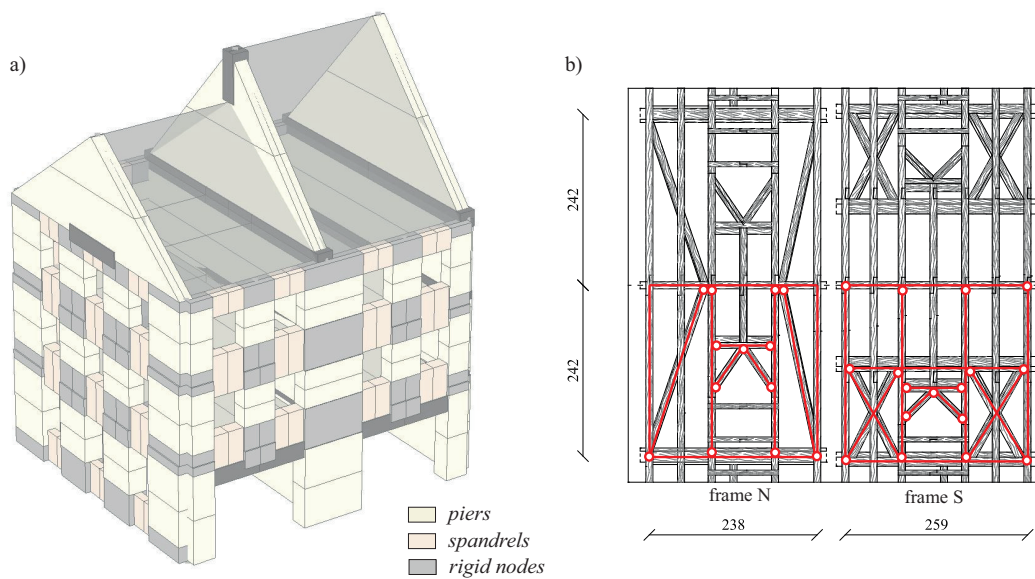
Stone masonry building: (a) Equivalent frame model of the complete building; (b) Timber frames providing shear stiffness to the roof diaphragms
